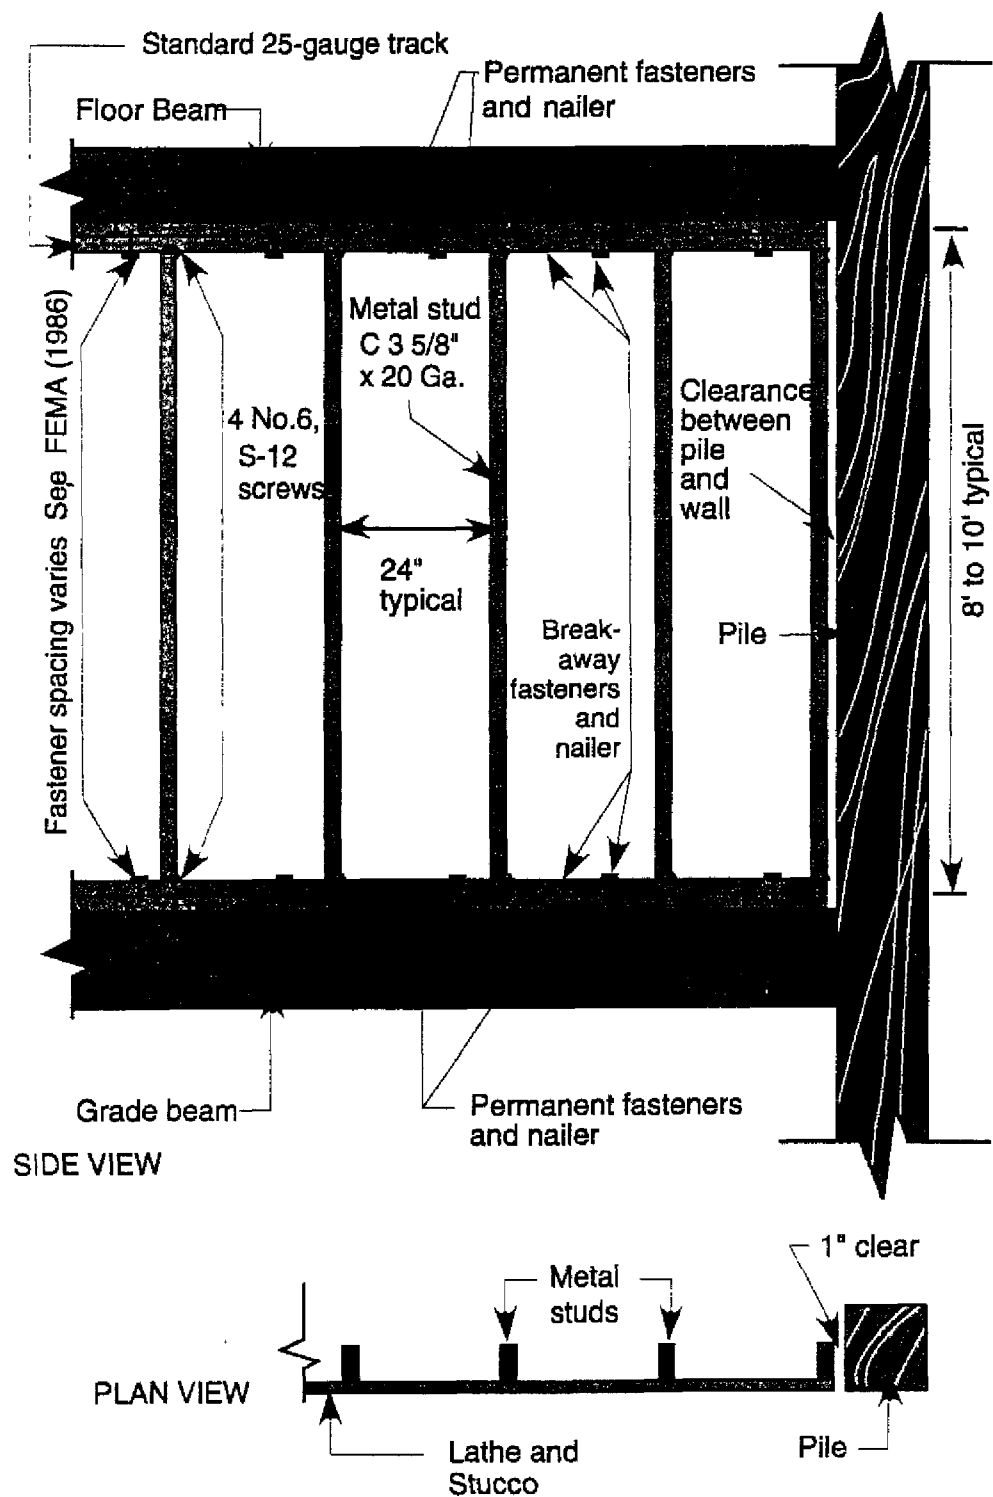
Light-gauge metal stud breakaway wall (after FEMA 1986).
